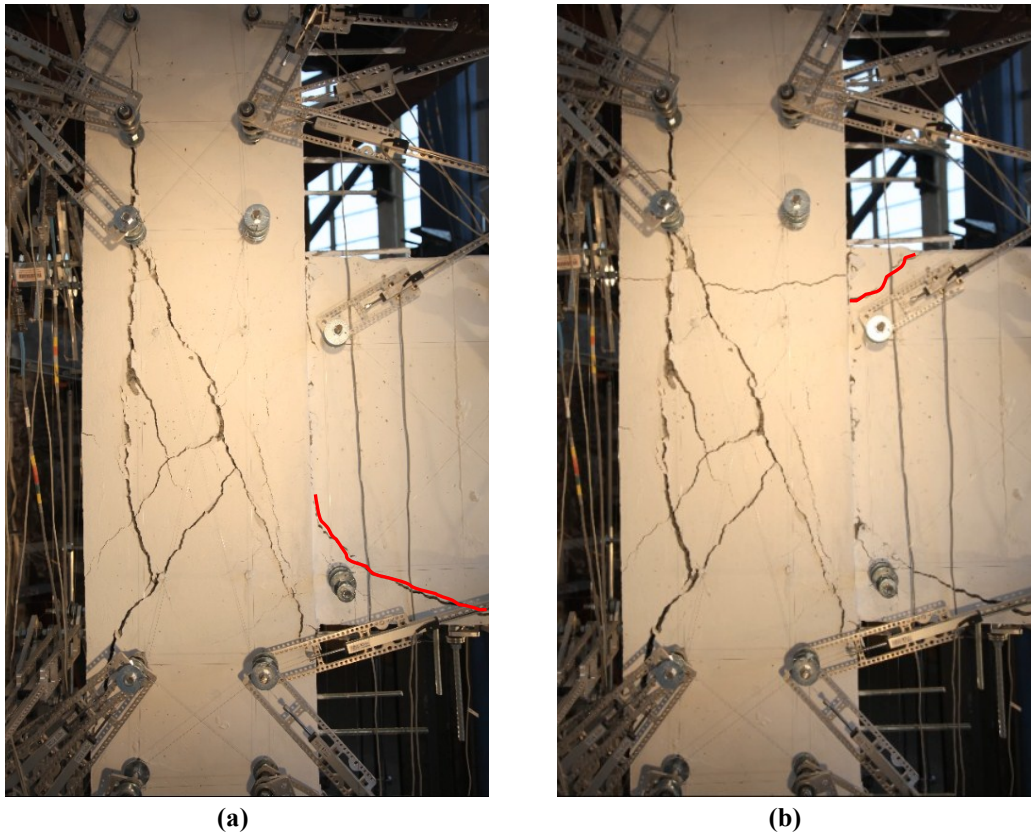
Twist deformation of EW beam during NS beam loading in specimen U-BJ-1
